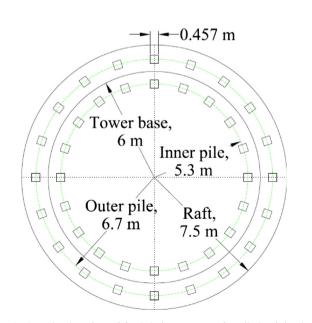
Sample plan view of final design outcome for piled-raft in clay.
